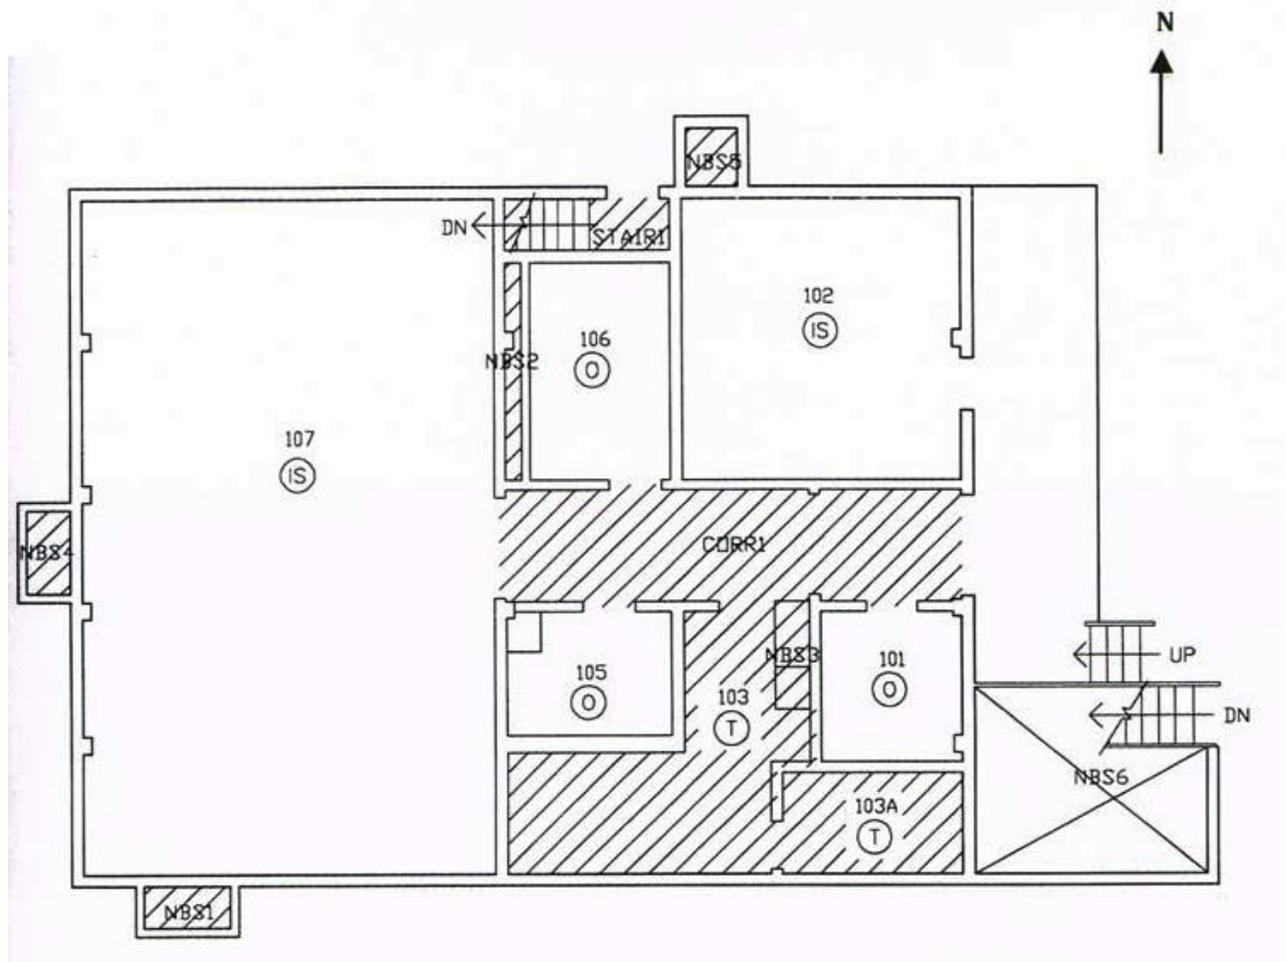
Office Building 827A - First Floor, Facility Keyplan, 1996. LLNL Archives (PKS96-827A-001BA)
